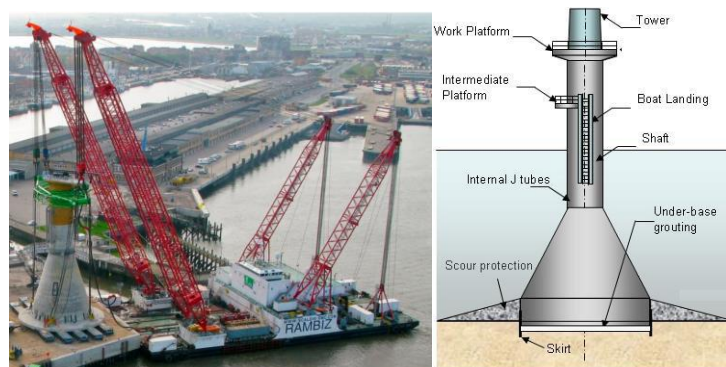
Left: Scaldis' Rambiz preparing the lift of a concrete GBF similar to the C-Power foundations(Alonso, 2013). Right: GBF concept⁵
